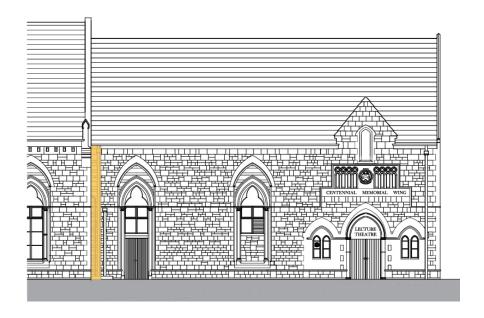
Existing 1958 Wing Façade Plan & Elevation. Area in orange indicates extent of the <u>listed</u> façade fabric removal for the separation in relation to the whole 1958 listed façade.
